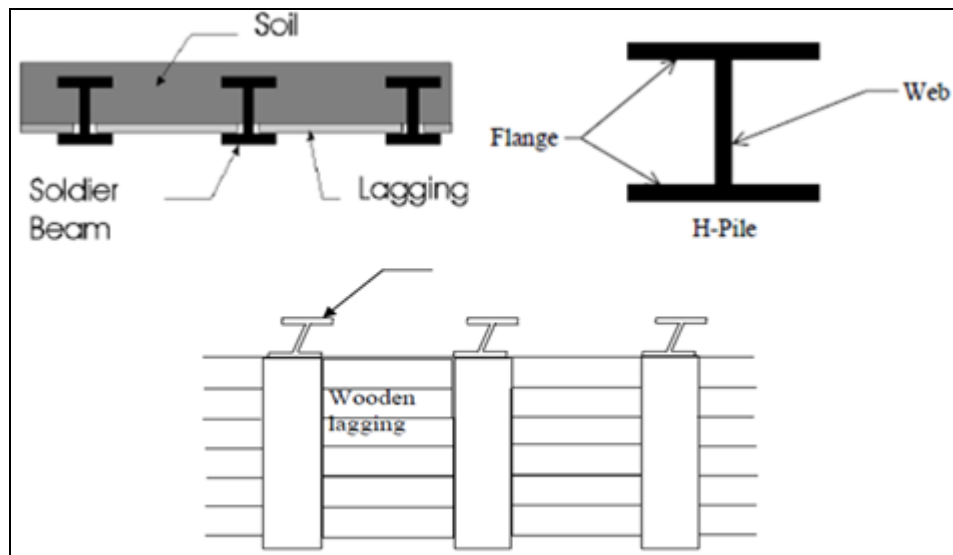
Soldier beam and lagging cross-section and view [10]
